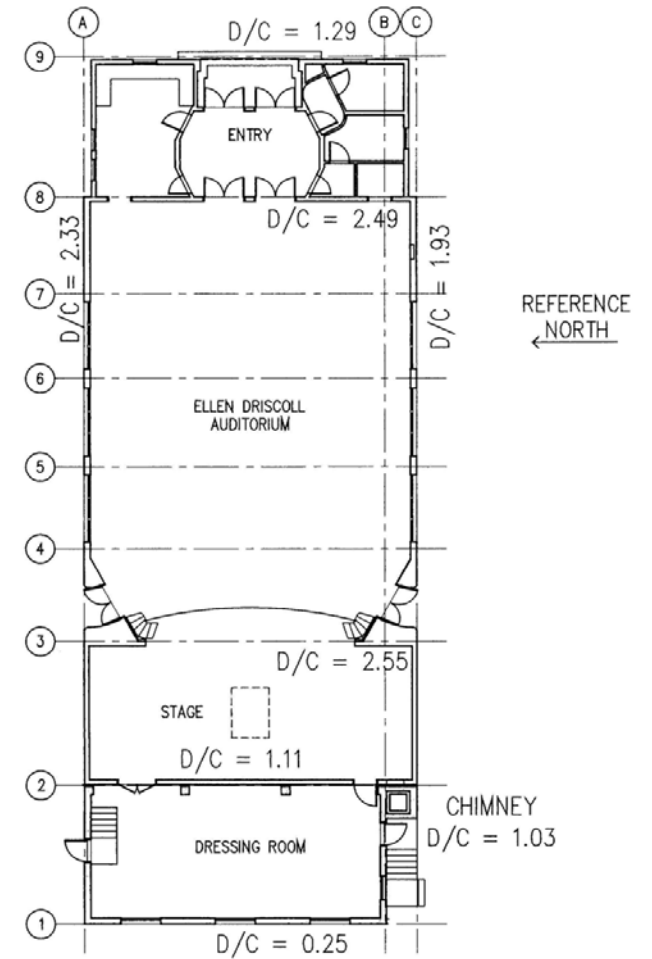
Floor plan of Building C. Demand to capacity (D/C) ratios for the principal shear walls are also indicated.
